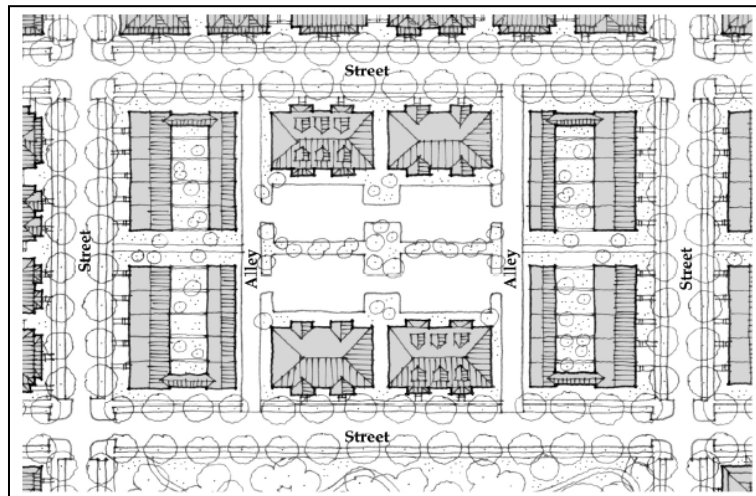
A: Multi-Family Garage and Parking Configuration
